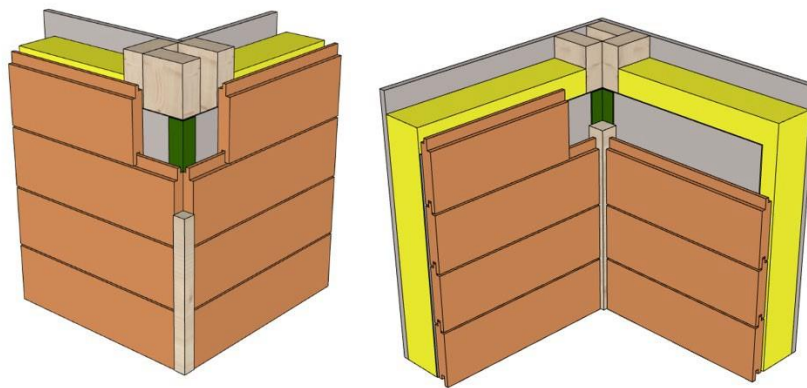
Internal and External corner details - Horizontal installation and direct fixed
